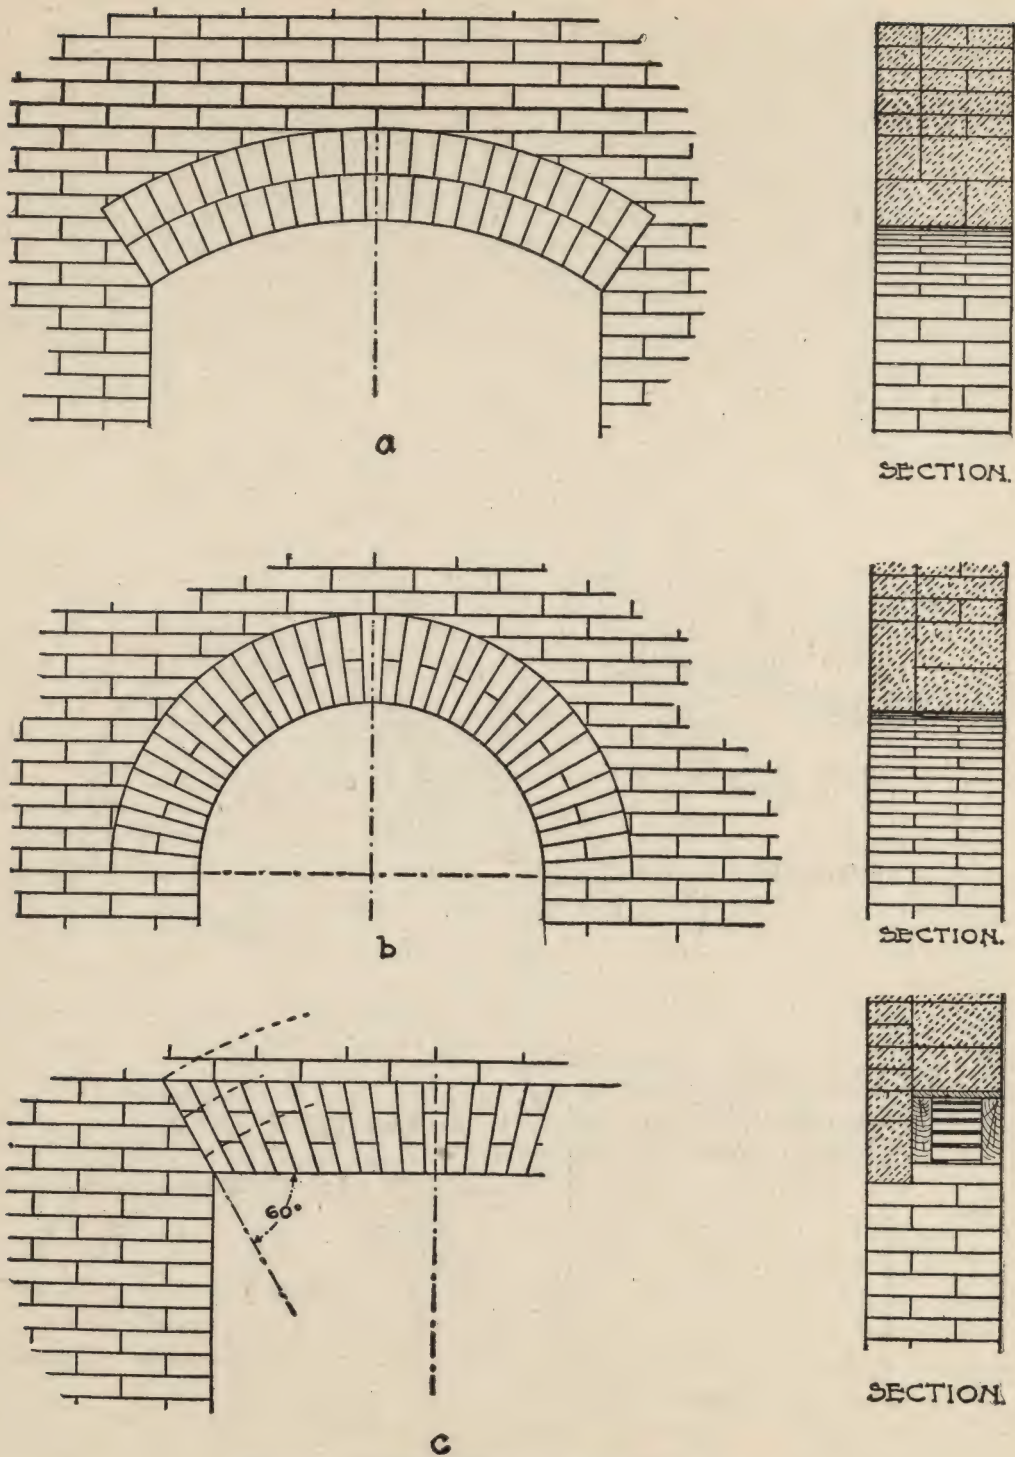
CONSTRUCTION OF BRICK ARCHES.
